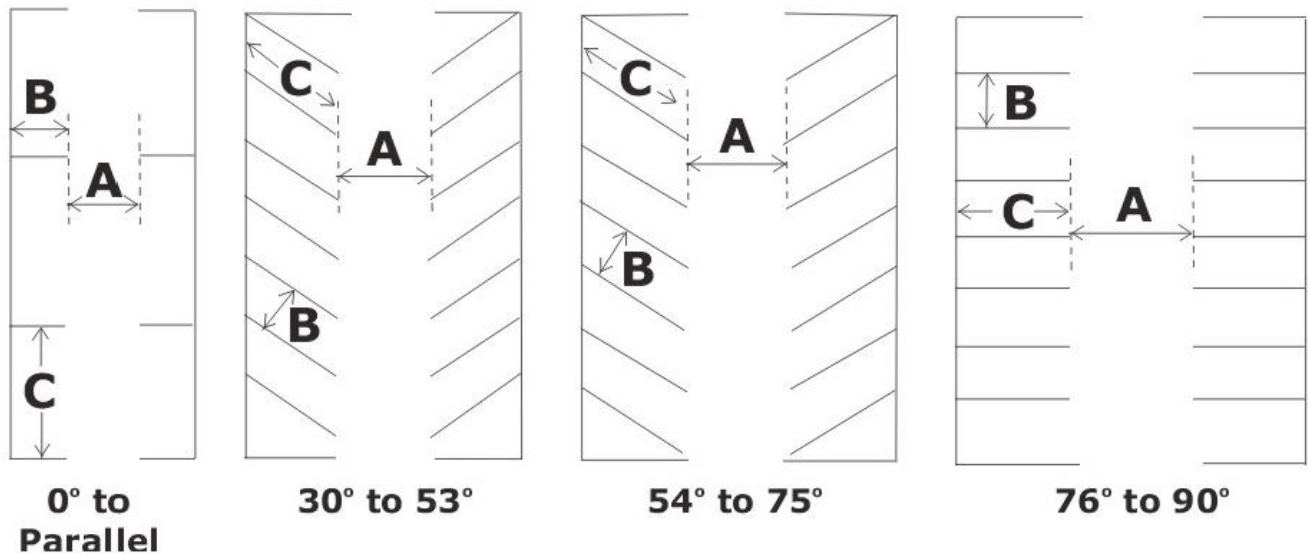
Parking space and aisle requirements based on angle of parking.
